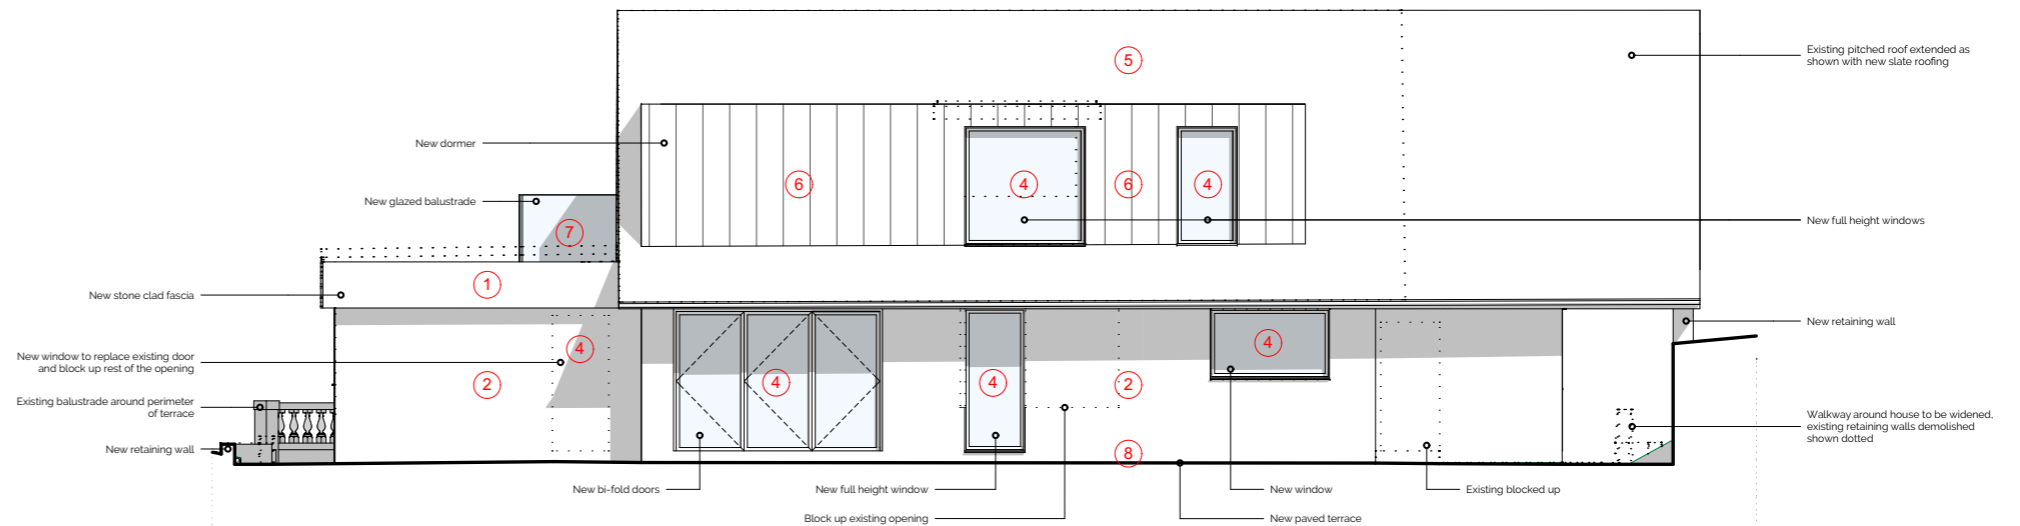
71 Leeson Road Proposed North Elevations - Not to Scale
